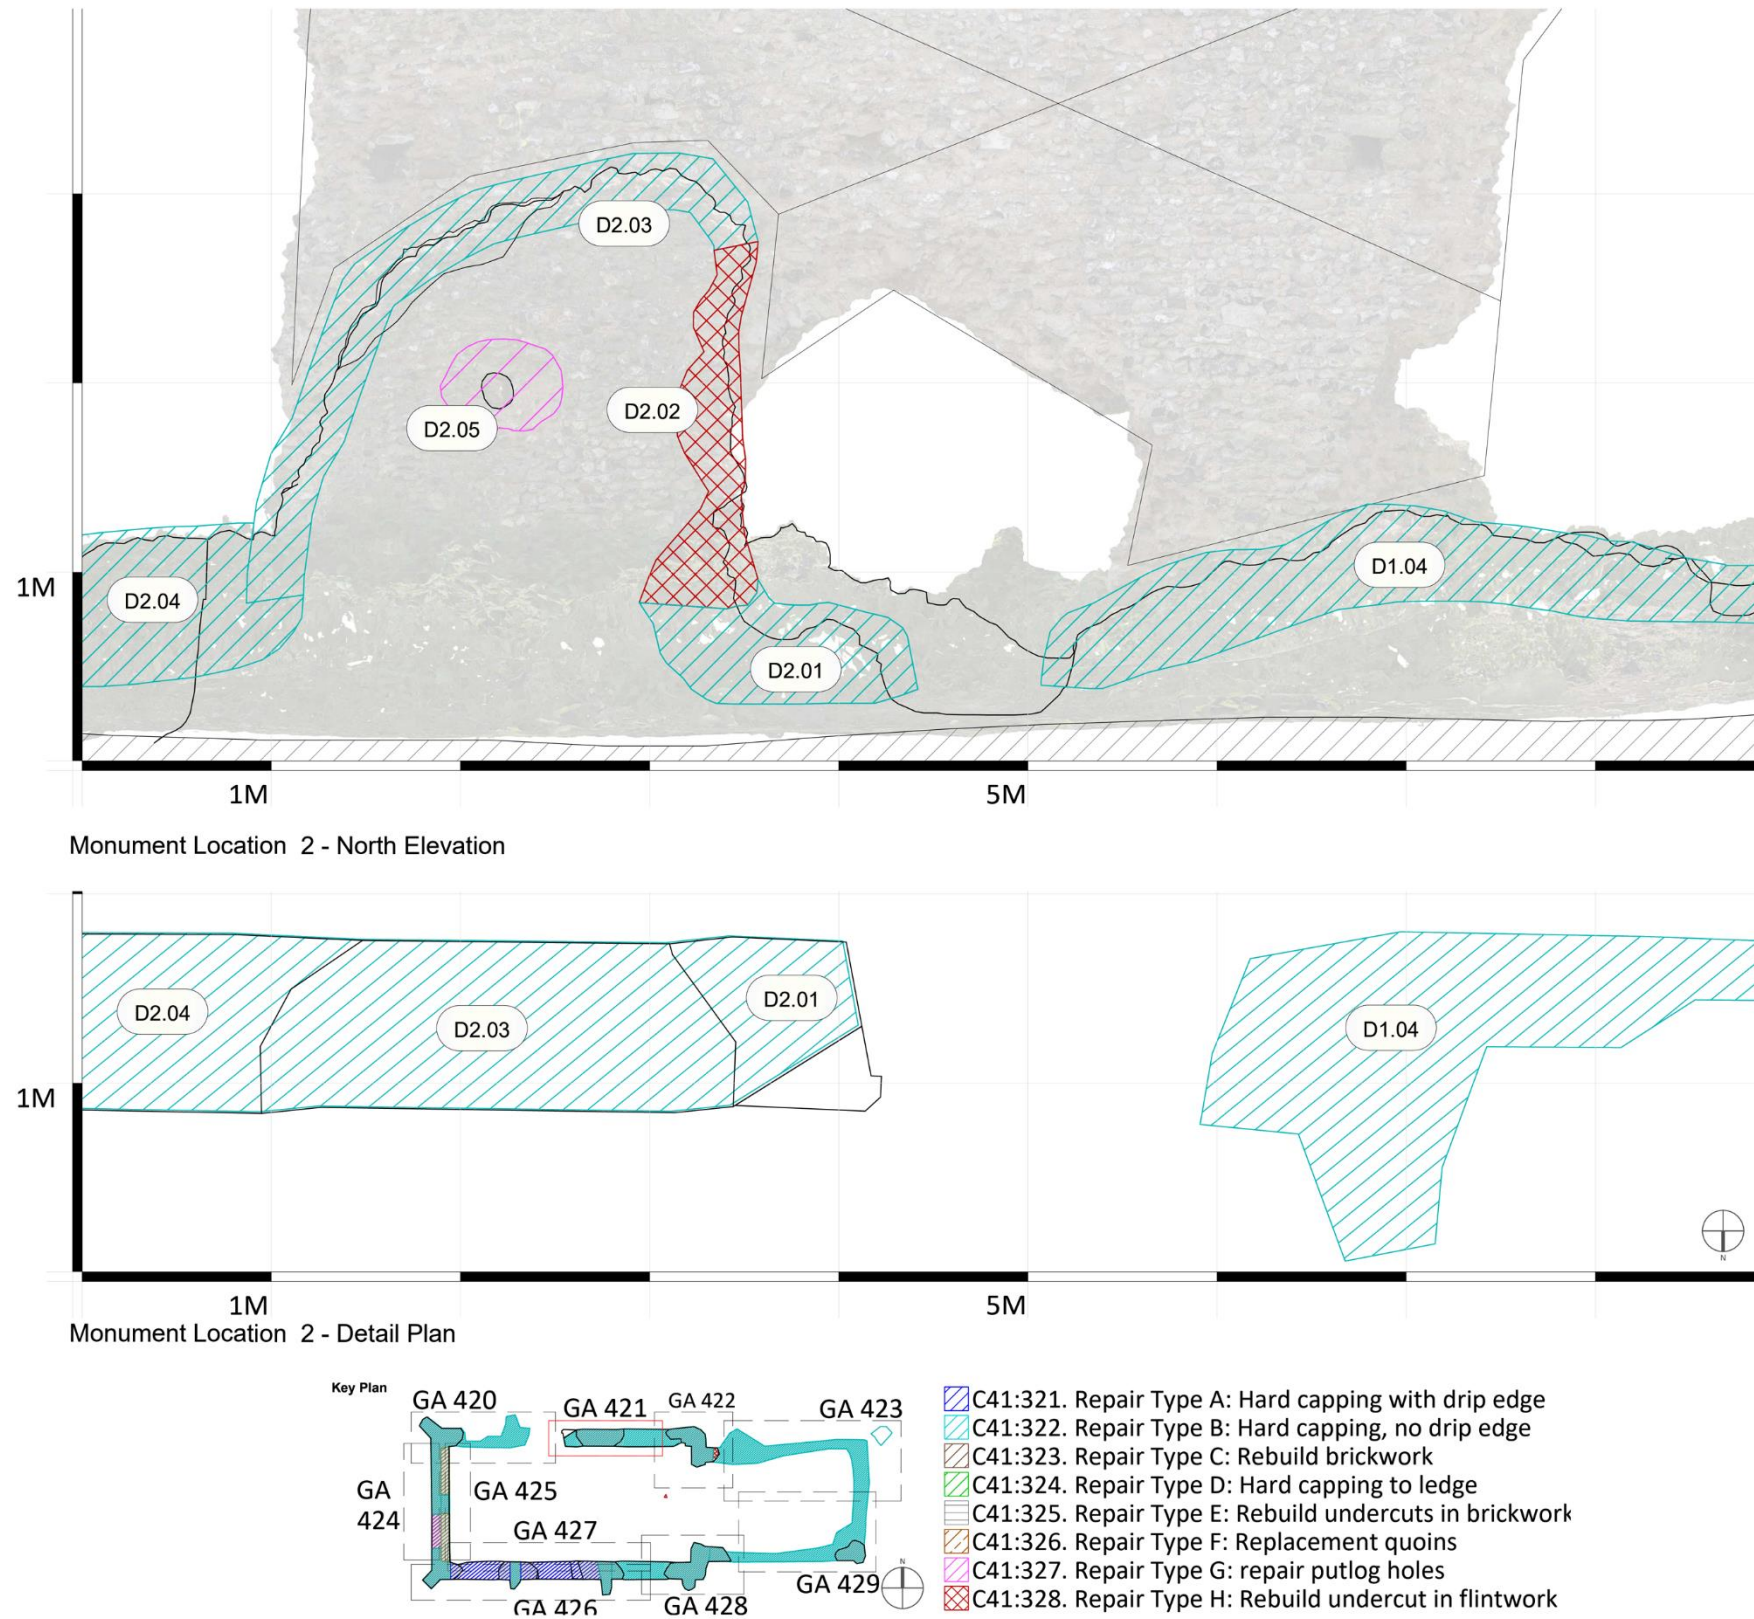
Works undertaken to the north nave wall (scale 1:40)
